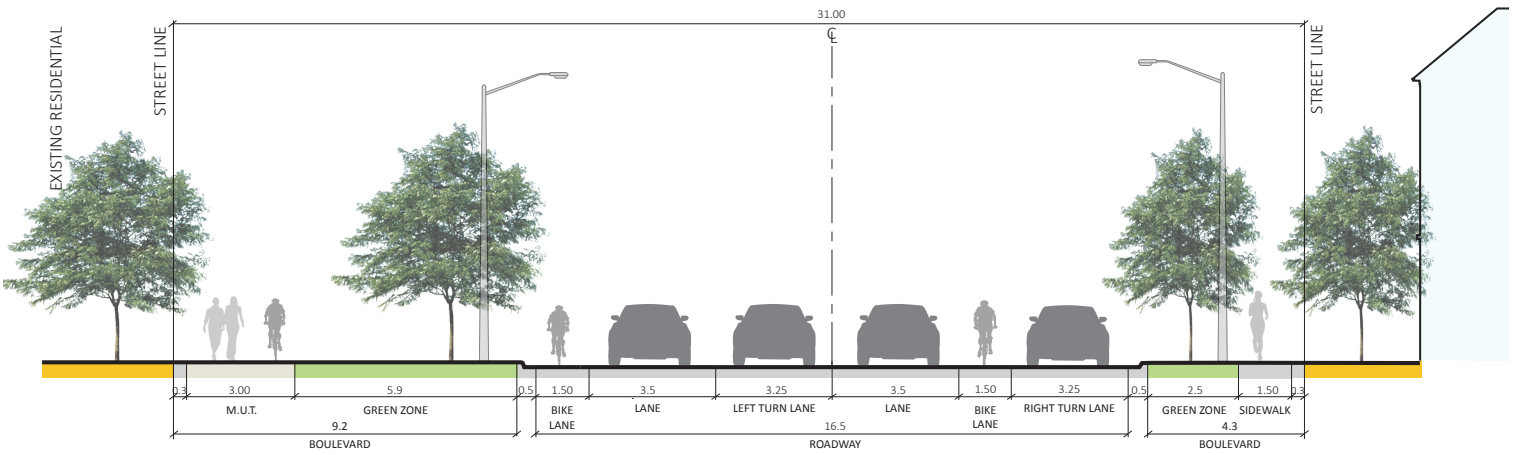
Airport Road (31m R.O.W.) Cross-Section
